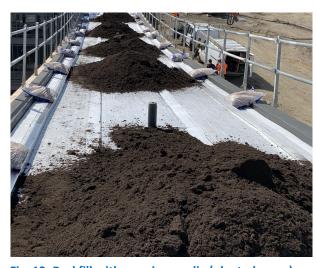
Backfill with growing media (planted areas) or sand (paved areas).
